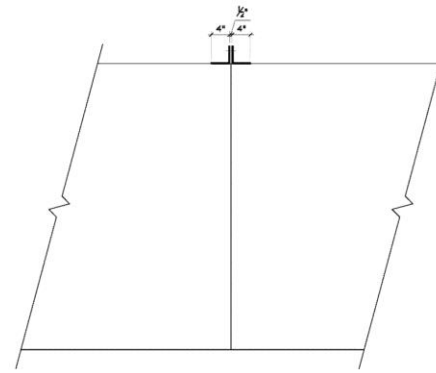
PONTOON "E" FRAMING DETAILS
